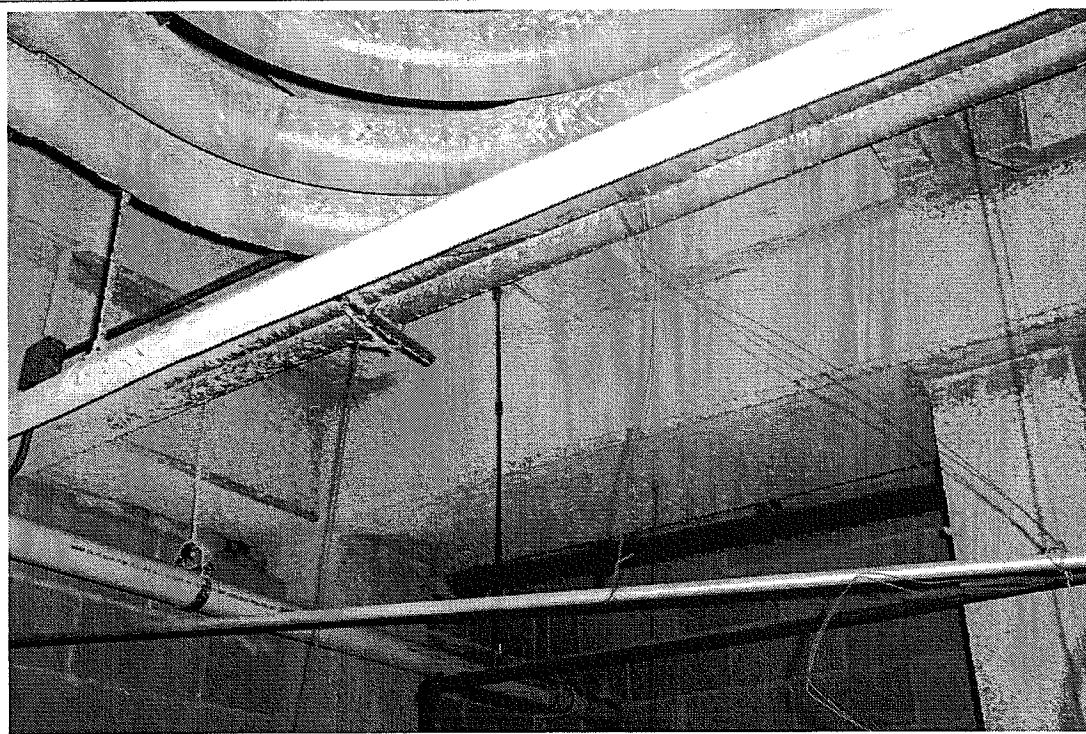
Main Terminal, Basement, South Hallway - General view of fireproofed concrete decking and structure above Ladies Rm
